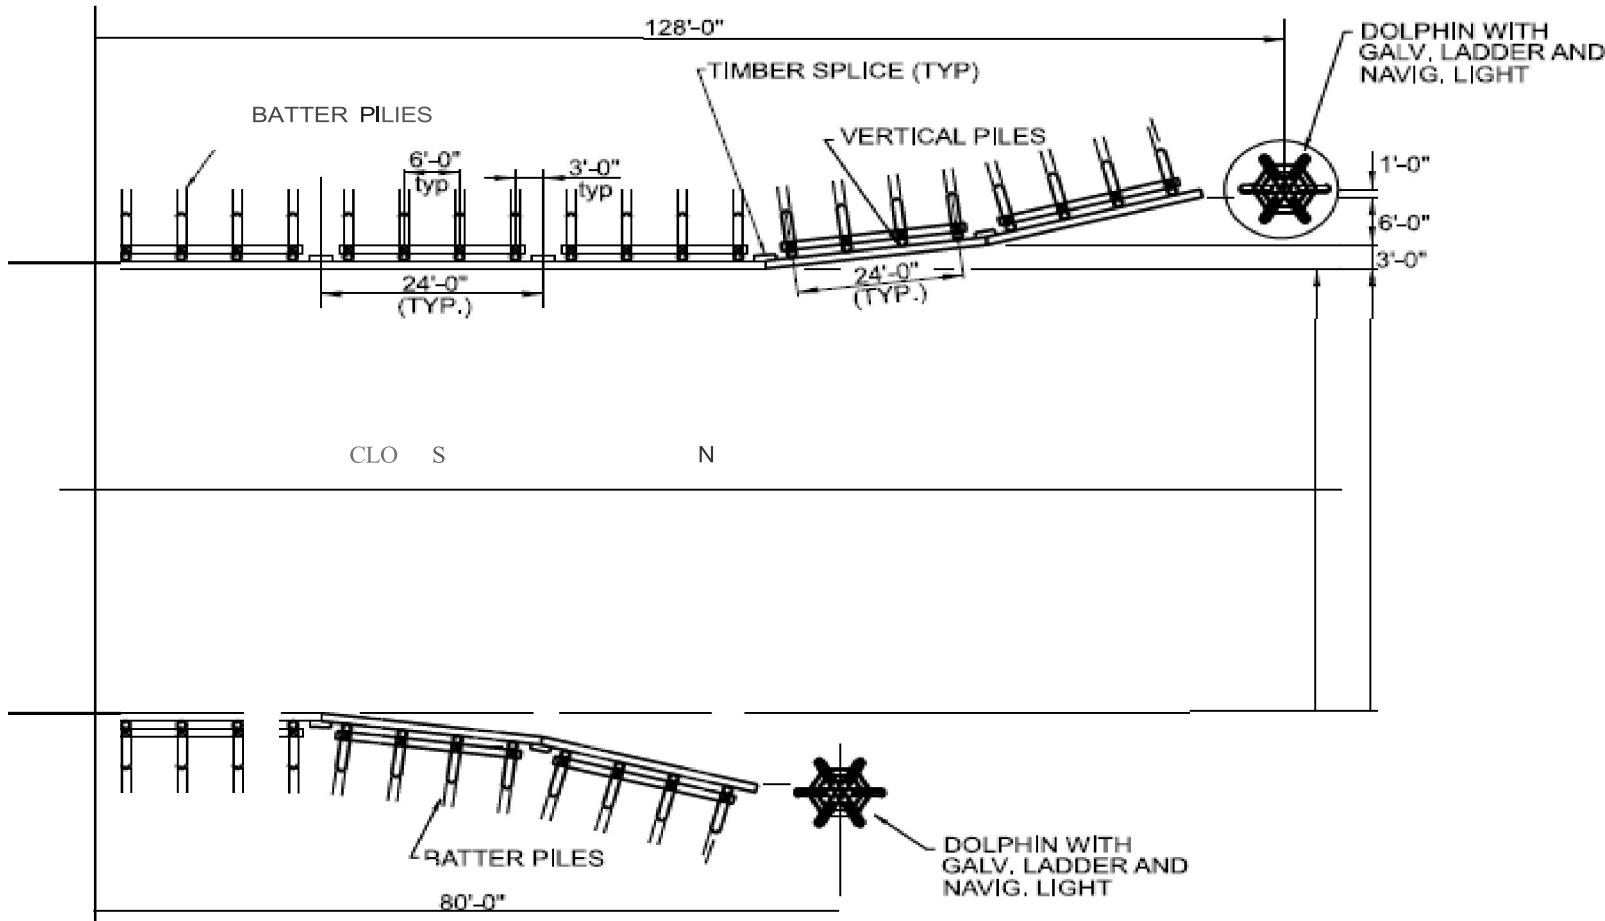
Plan – Guide walls, Fenders, and Dolphins
